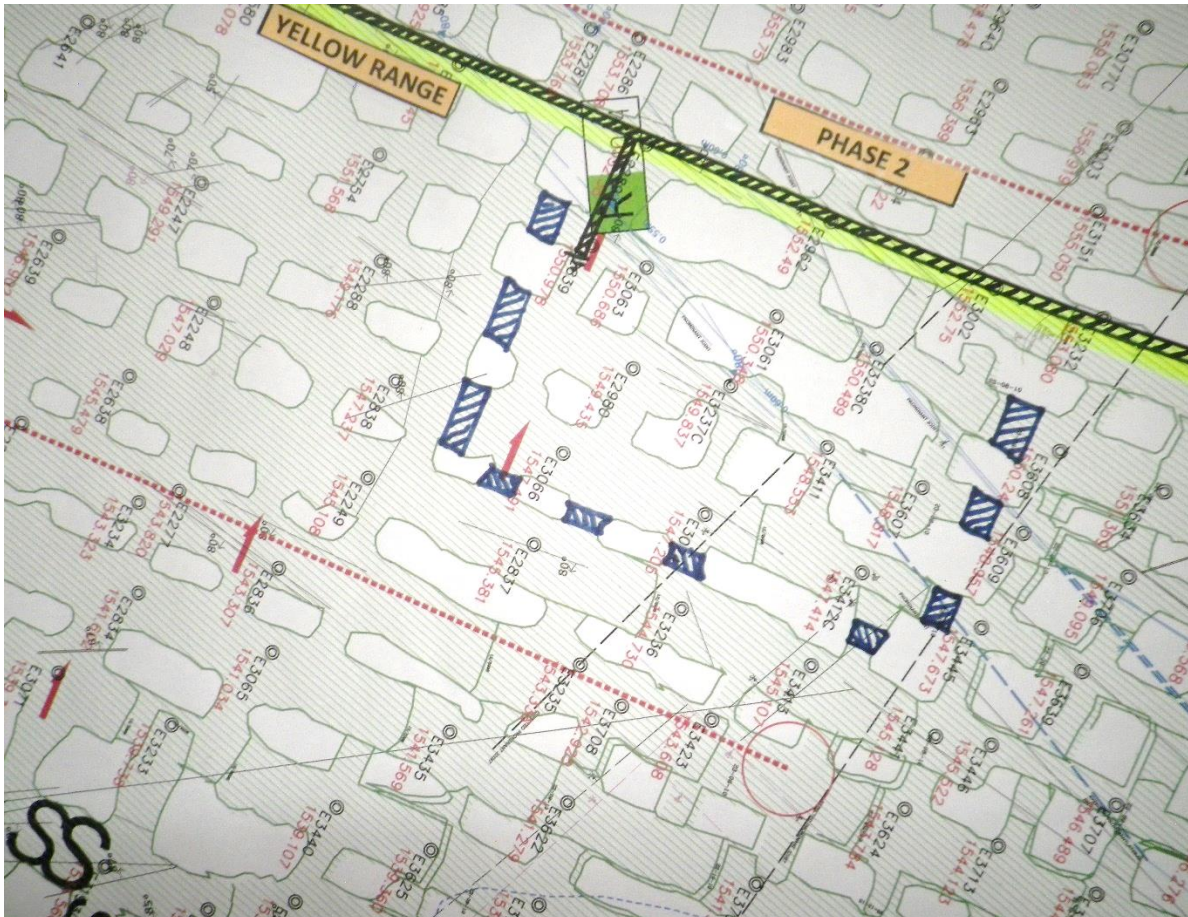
Planned trial site where the holings between pillars had to be sealed using backfill bags.
